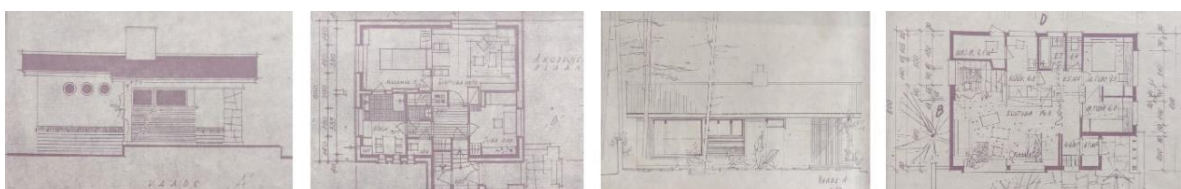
Examples of bungalow dwellings from 1965 (left to right: project 60 with elevation and ground floor; project 61 with elevation and ground floor) (RPI Estongiprogorstroj, 1956)
